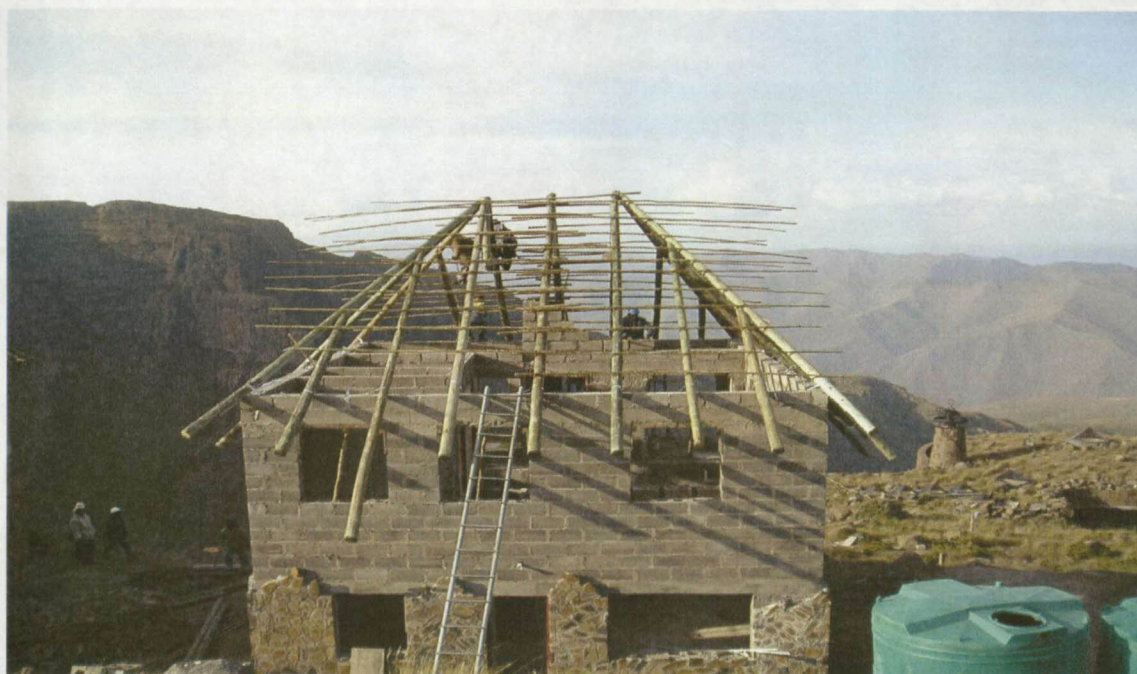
The photo demonstrates timber roof trusses and rafters, Matsoku, Lesotho (own Information).
